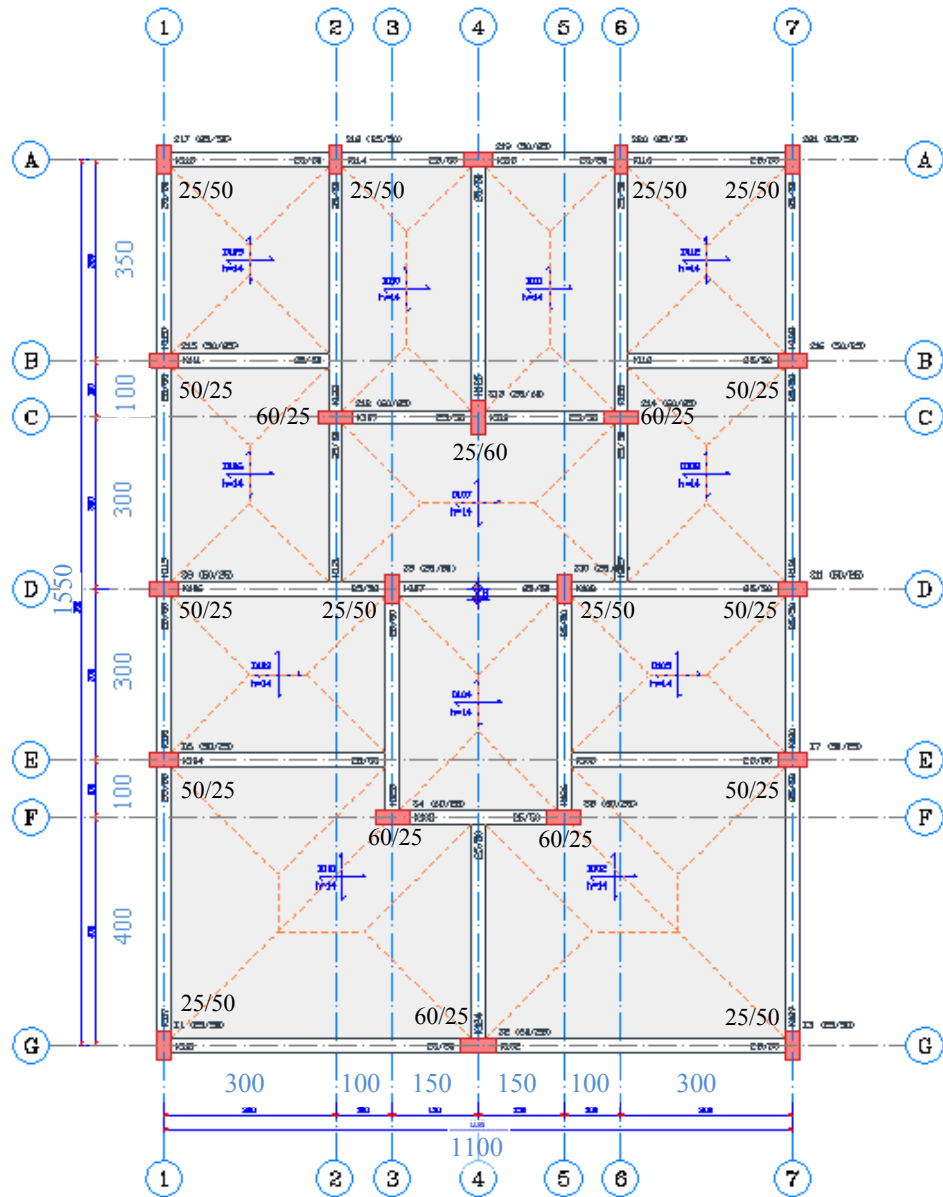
Adopted ground-story floor plan of the same building mentioned in Figure 5.3. This modified floor plan is used while modeling the 4-story building in this study.
